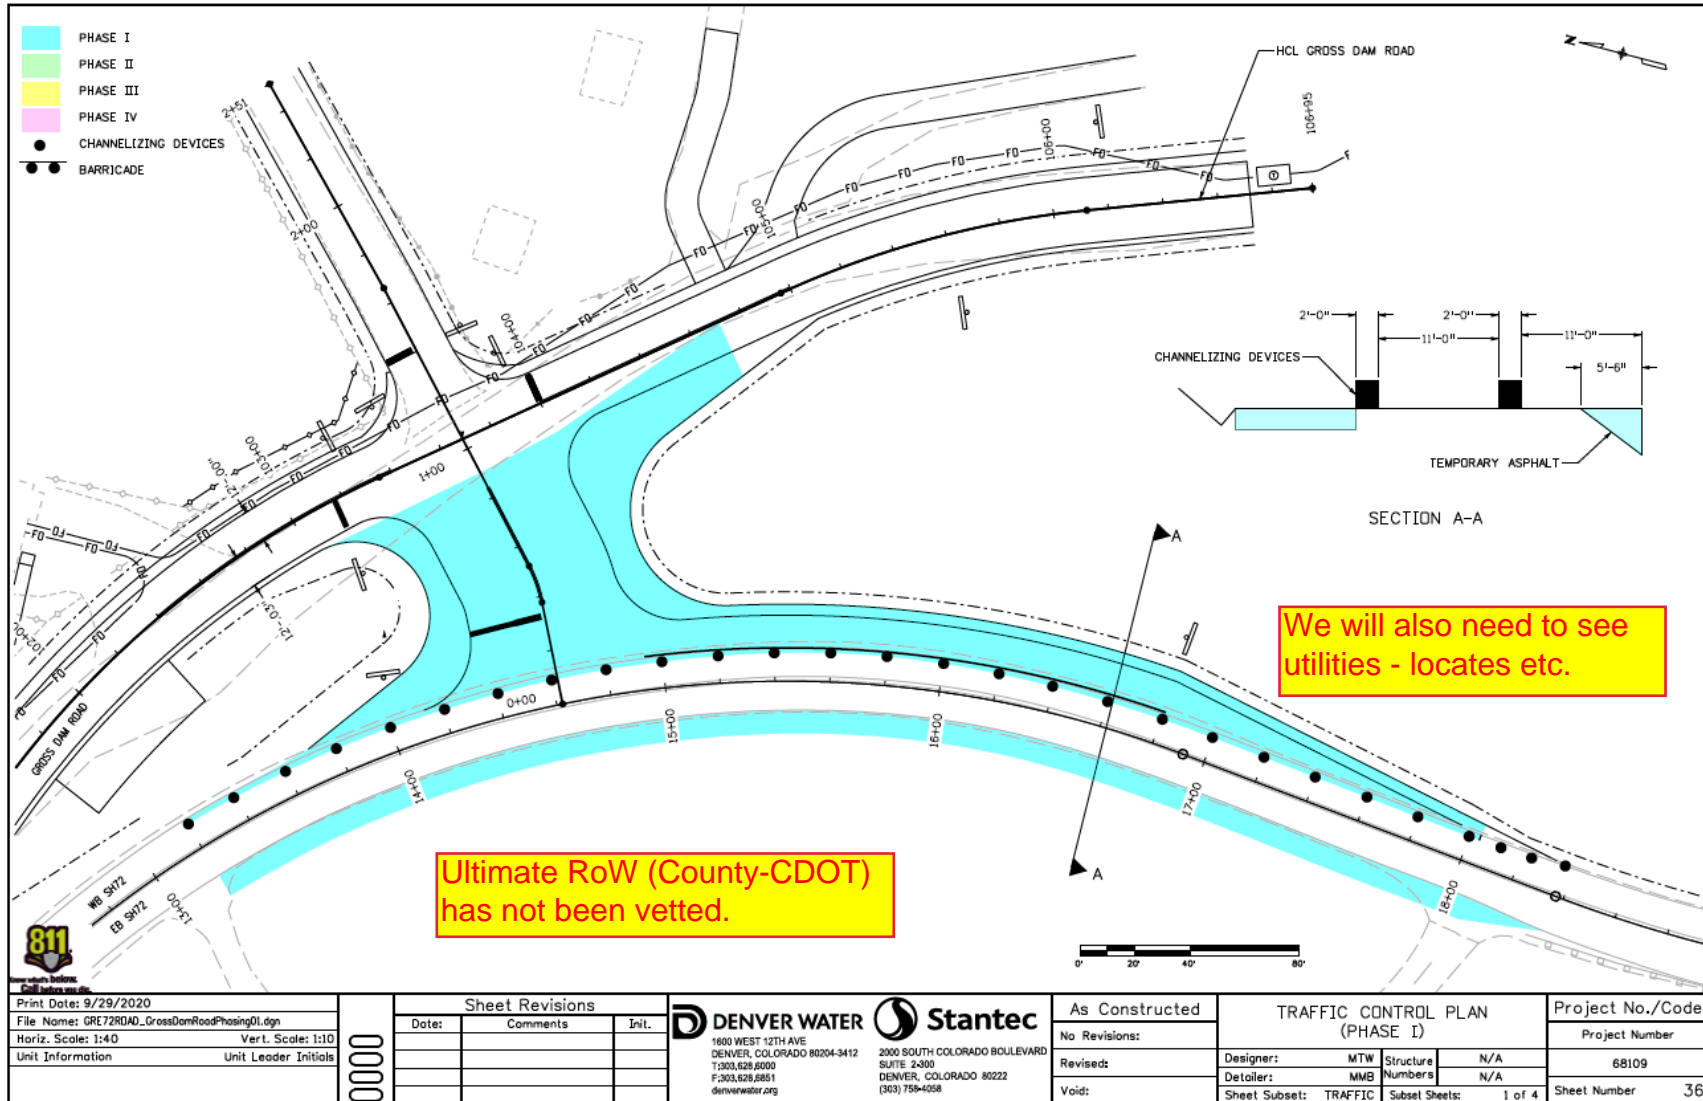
Gross Dam Road and SH 72 Intersection — Phase I
